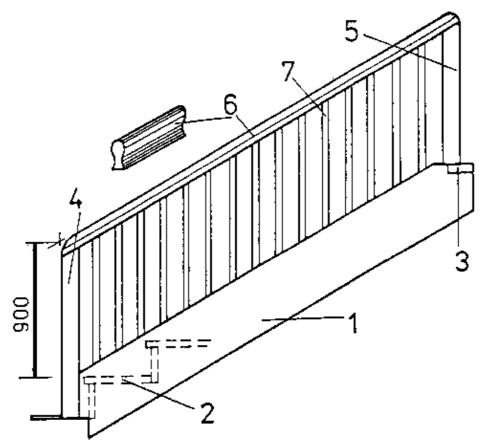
Stair railing with vertical railing bars – 1 outer string, 2 bottom step, 3 head step, 4 bottom post, 5 head post, 6 hand–rail, 7 vertical railing bar
